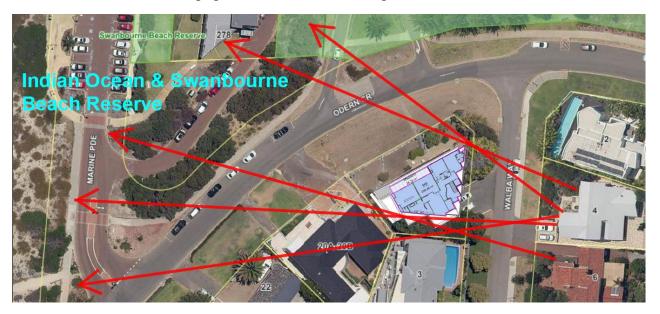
Diagram depicting the proposed upper floor plan (superimposed on subject site). Viewing corridors of the Indian Ocean and Swanbourne Beach Reserve accessible around the proposed upper floor from No's 4 and 6 Walba Way are indicated by red arrows.
